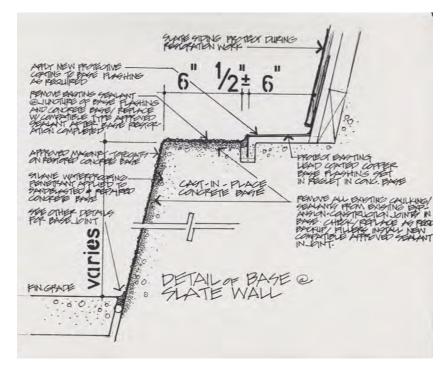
1986 Construction Detail at Base of Slate Wall. Eberson and Toto, Detail F/5.
